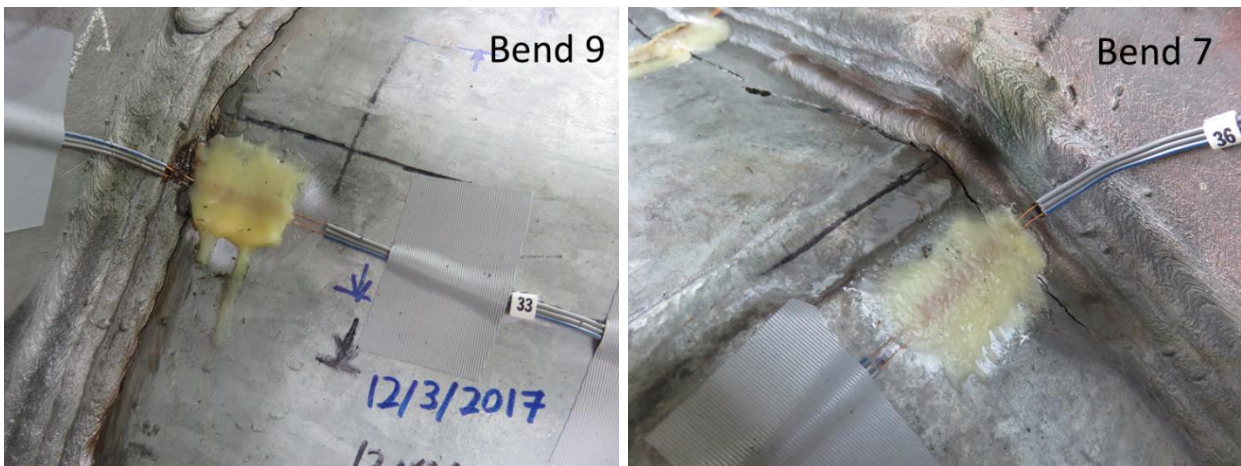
Weld-Repaired Specimen 33-3-12-TX-A2 – Adjacent Bends to Bend 8 Following the Fatigue Test
